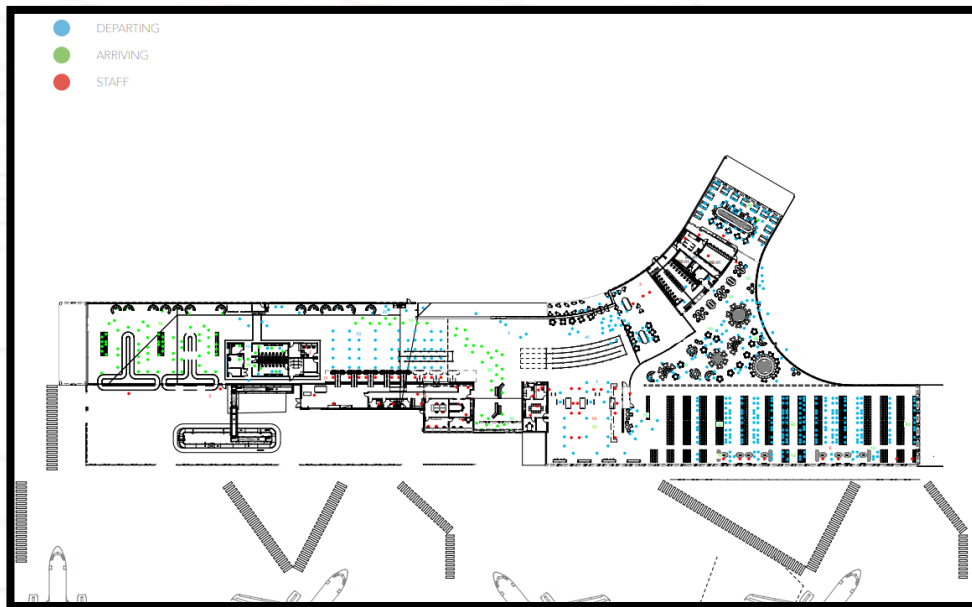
Newman Airport Terminal Redevelopment Project – Proposed Layout
